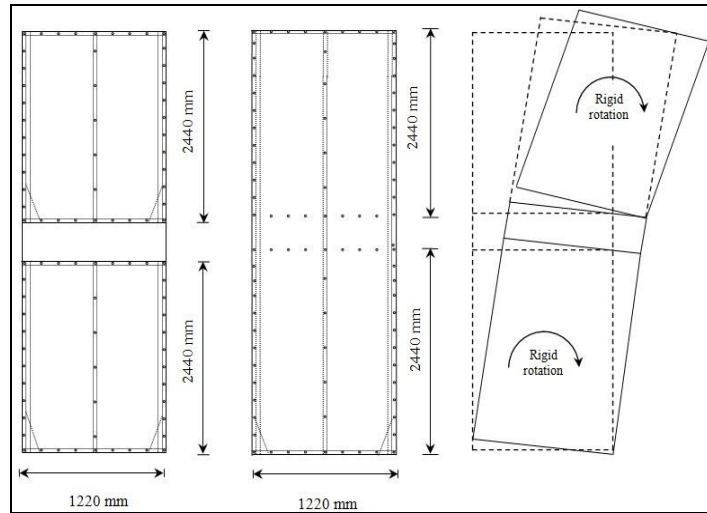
Two storeys two-element and two storeys one-element shear walls having a same sheathing-to-framing connections arrangement and uplift and lateral displacement for each SWP of a double-storey shear wall specimen
